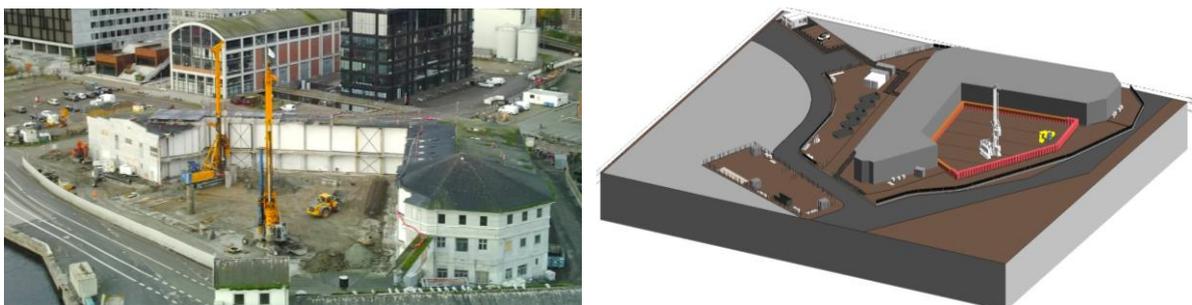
Case study construction site (foundation works and BIM-based site layout model).
